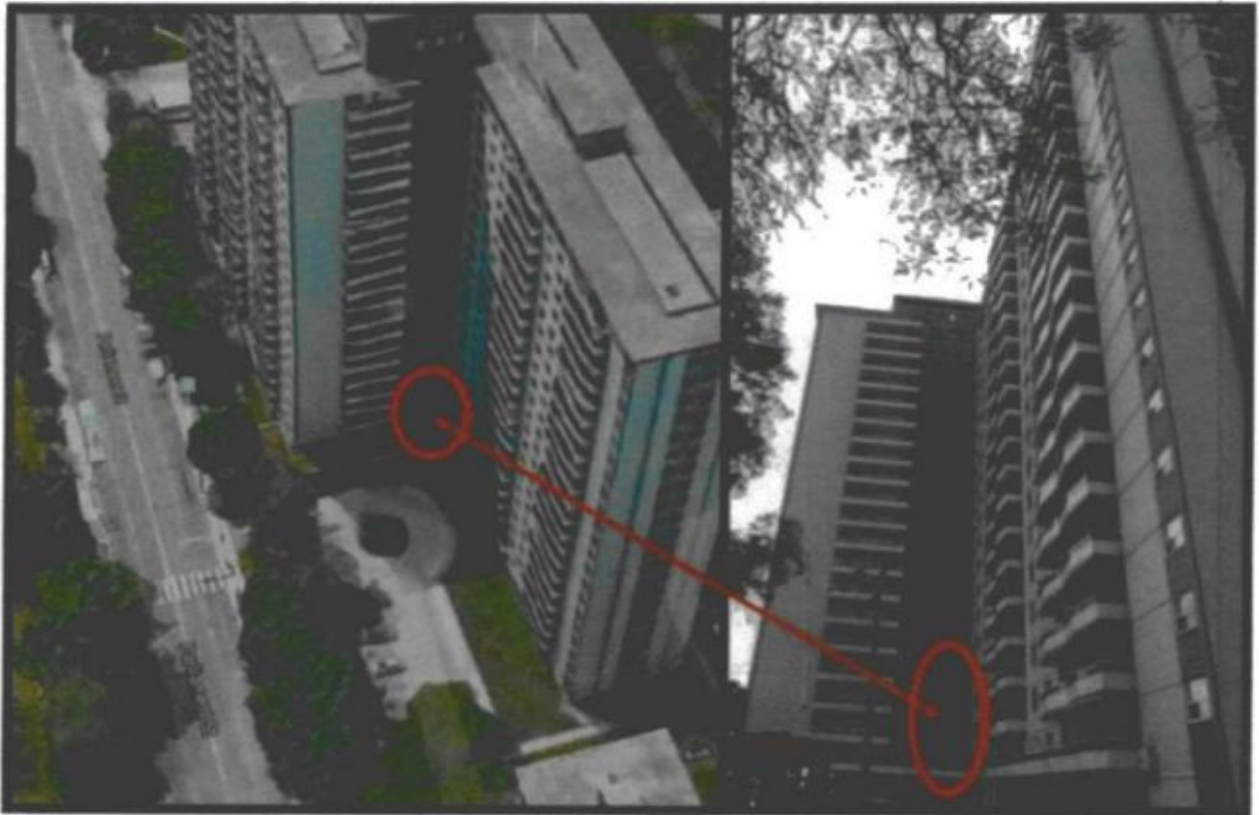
(East Facing Side) -- North and South Apartment Complex Units (Right Photo -- Main Entrance) -- Right Photo: Jpg # 1766
